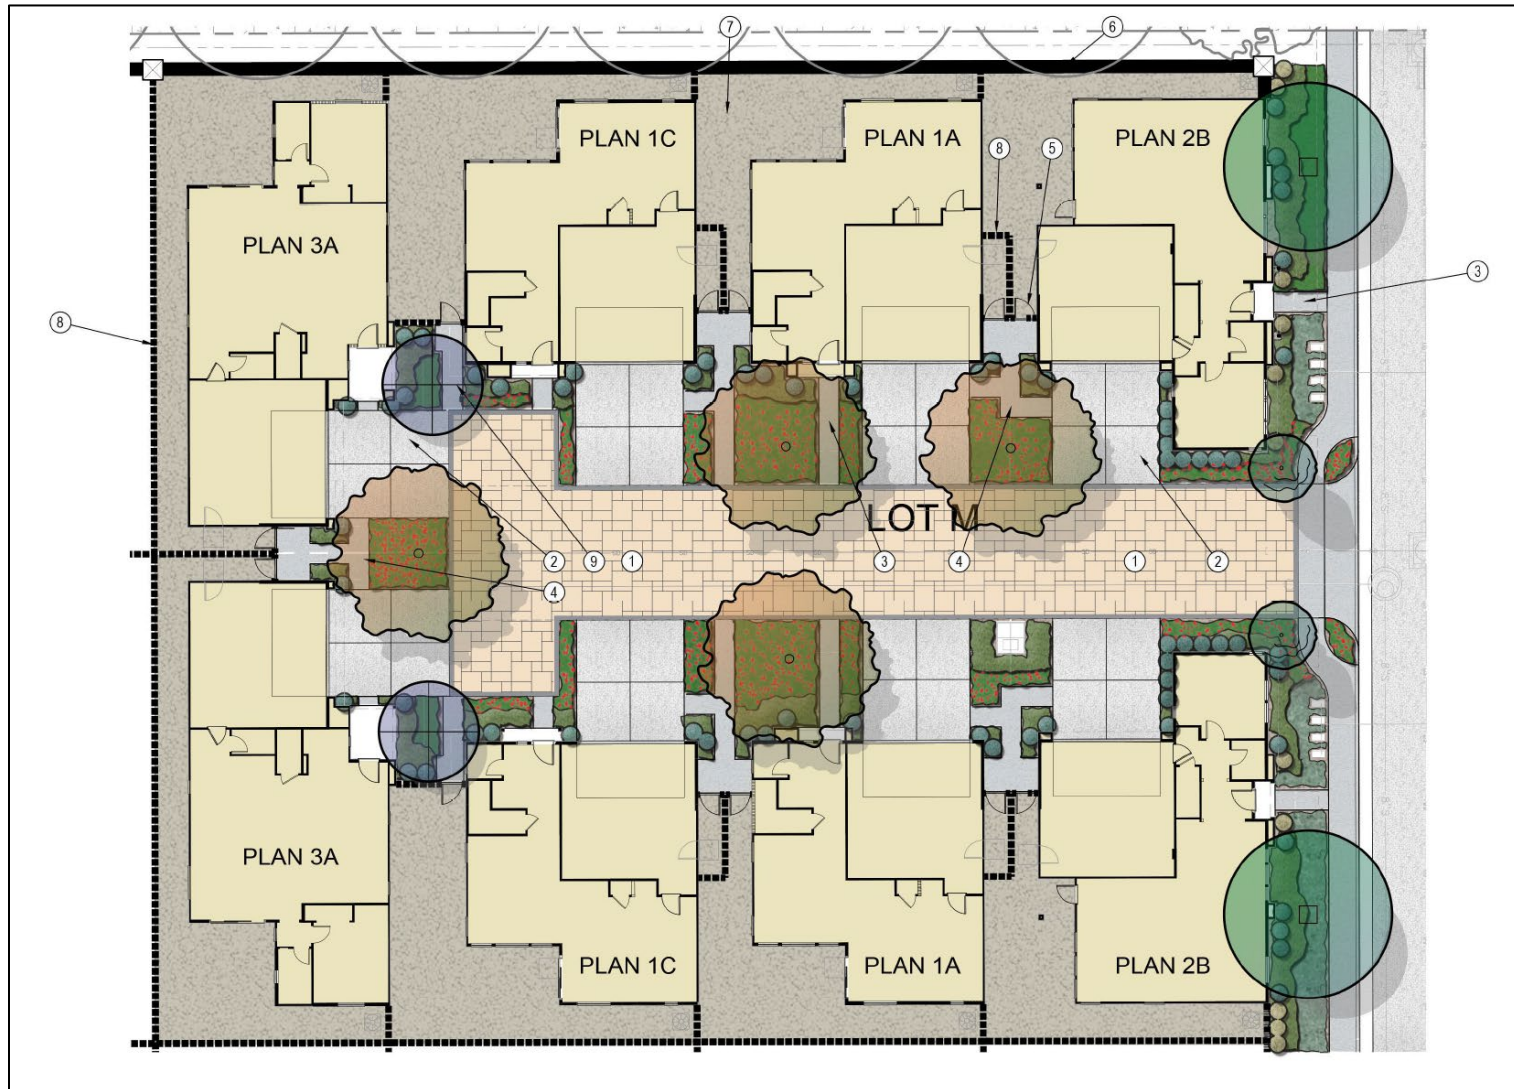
TYPICAL COURTYARD TOWNHOME LAYOUT
